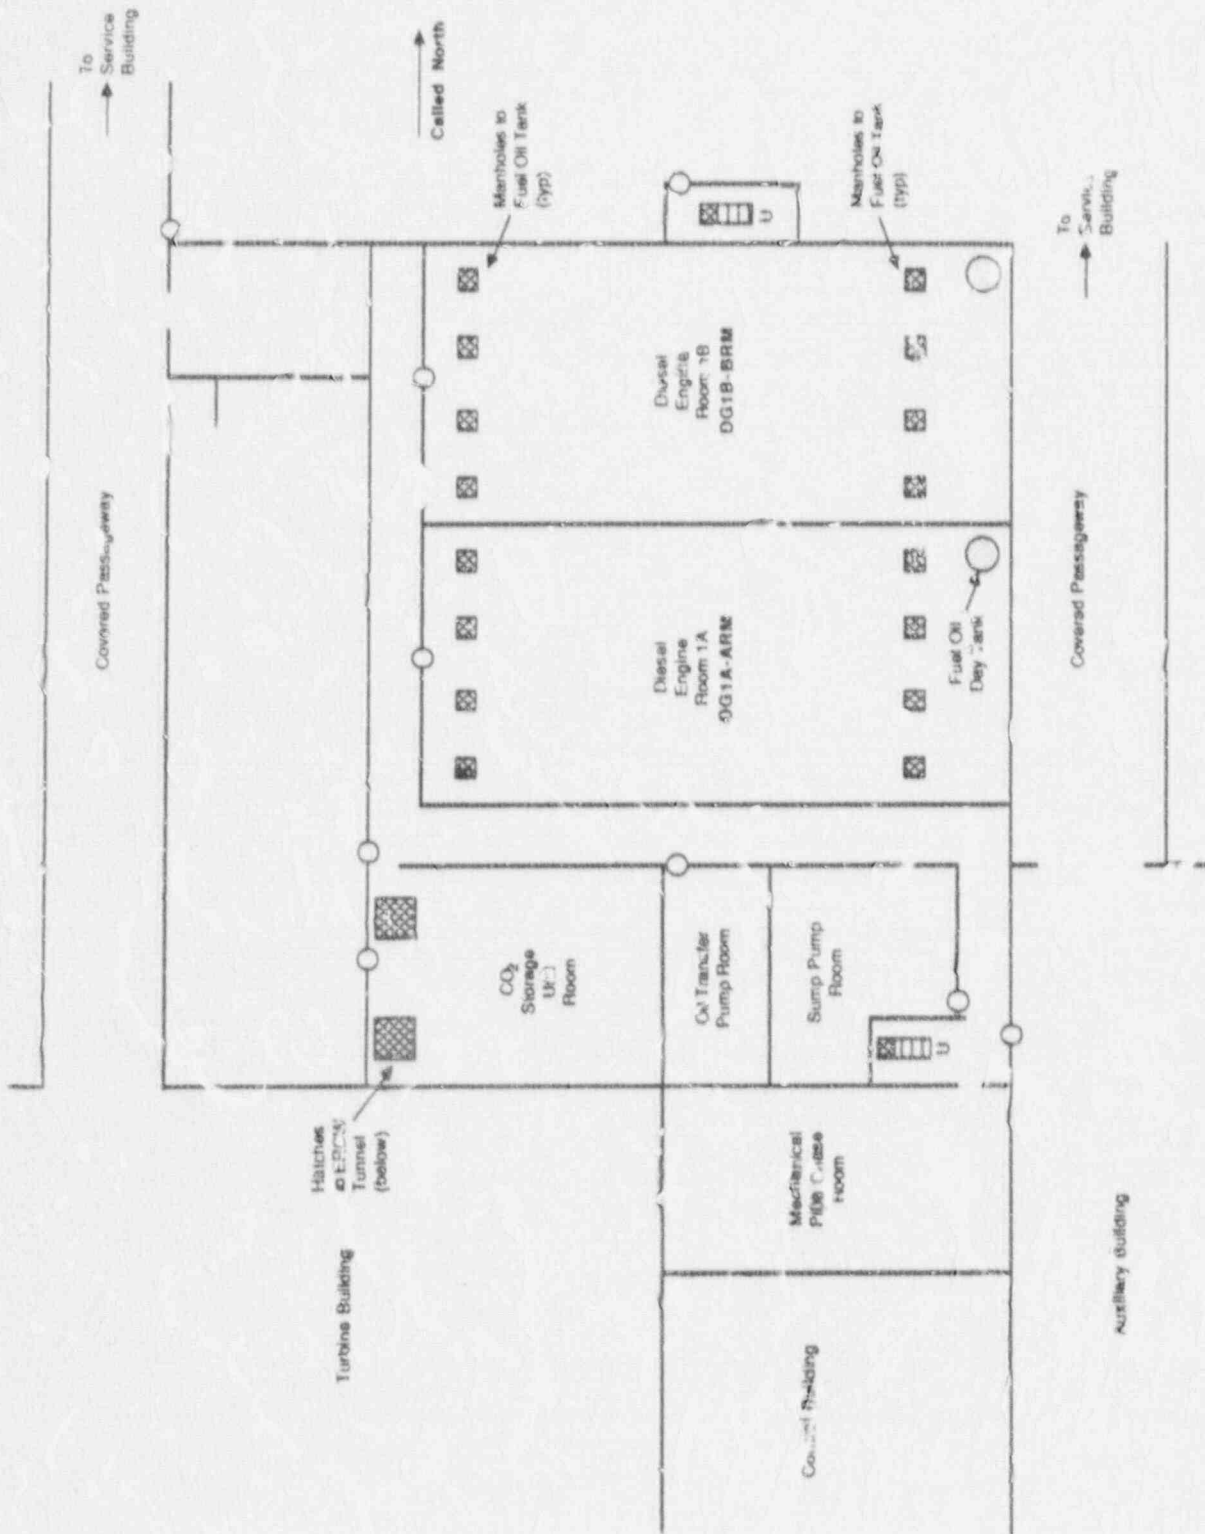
Bellefonte 1 Diesel Generator Building, Elevation 629'0"
